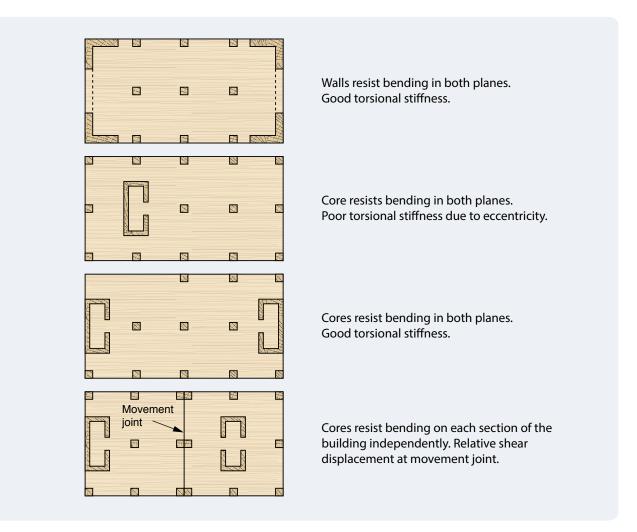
Plan view of different core and bracing wall layouts and their lateral response.
